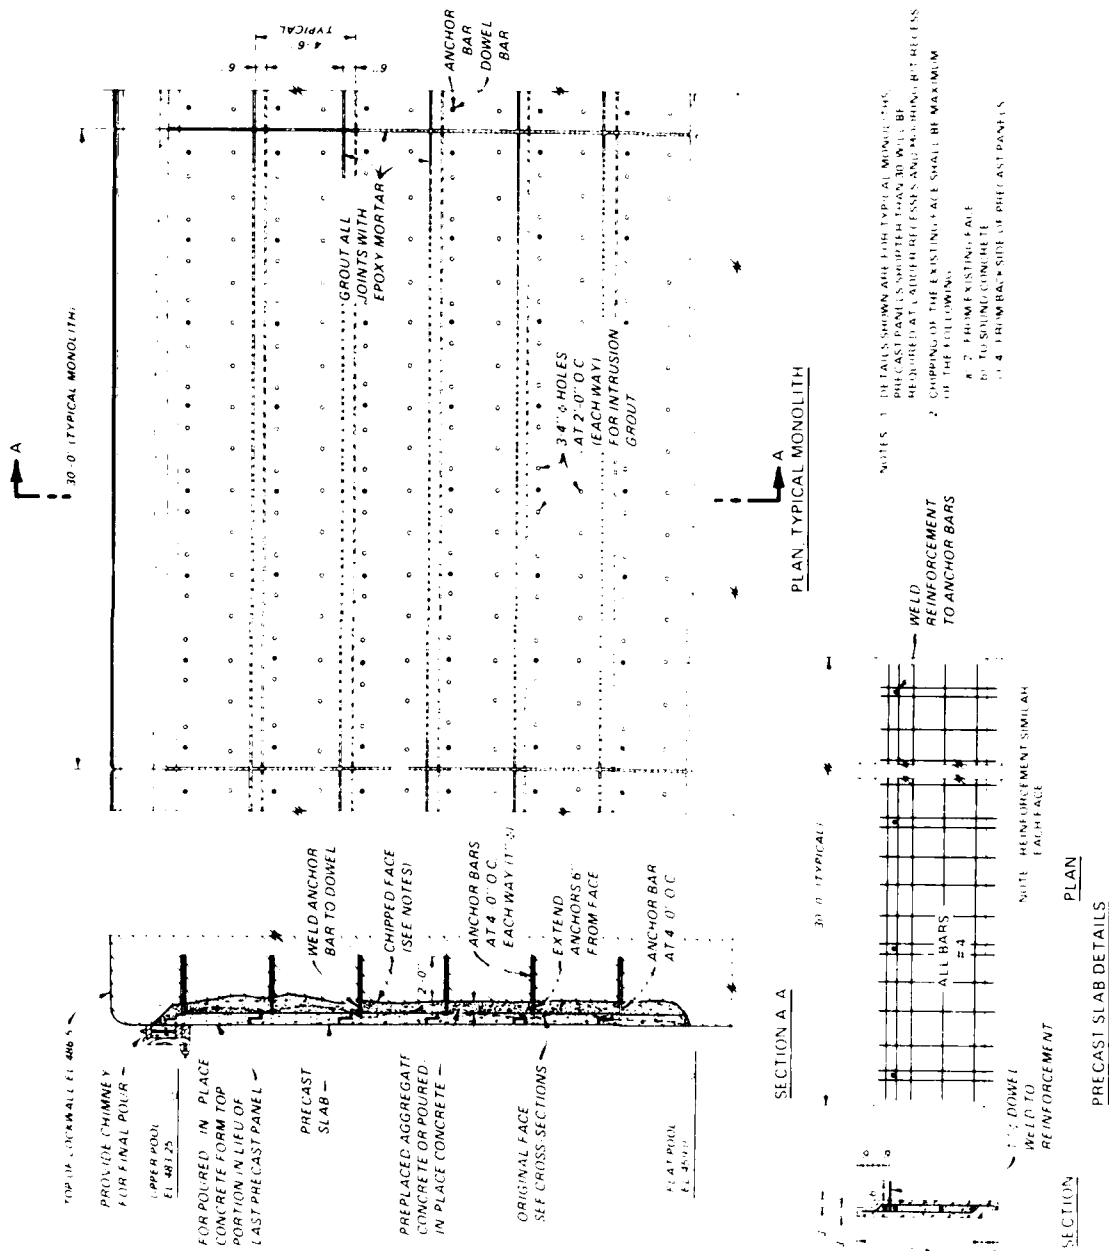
Lock wall resurfacing using precast panels, Marseilles Lock
